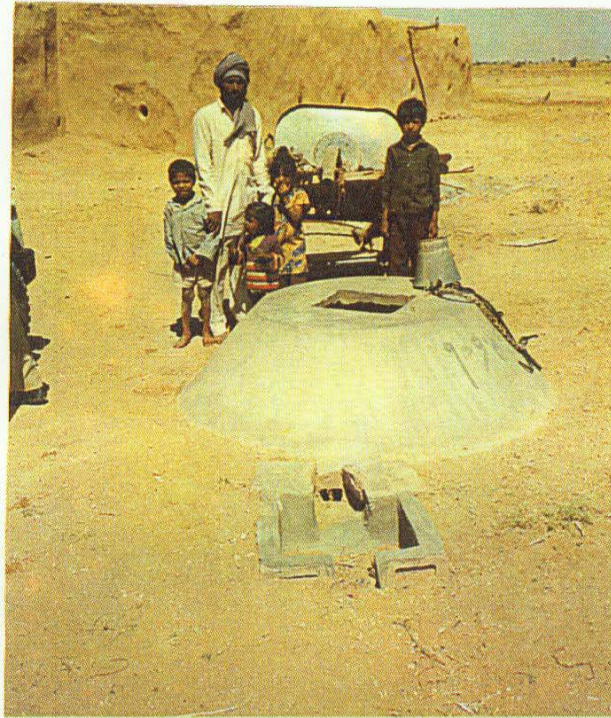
Small concrete structure constructed to store water from overland flow during monsoon
